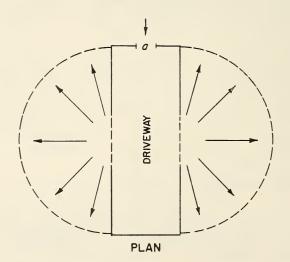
Preparation of a concrete-stave crib for ventilation. Walls of drive-way should be covered as shown and openings, such as those around inside elevator or ladderway, should be sealed. Air blown into driveway at a will then escape through the corn as shown.
